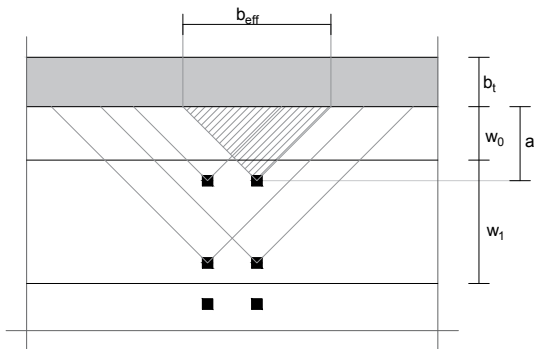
Load spreading towards the side girder at midspan in an isotropic floor plate
